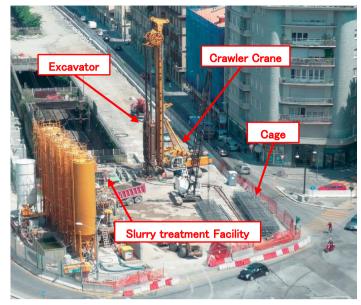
RC Diaphragm Wall Construction Procedure
